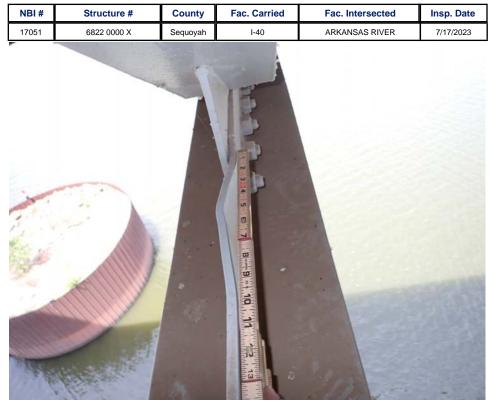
Looking east at the stringer diaphragm connection to stringer 4 at floor beam 5, span 6. Note: 8 1/2-inch-long horizontal crack in web.
